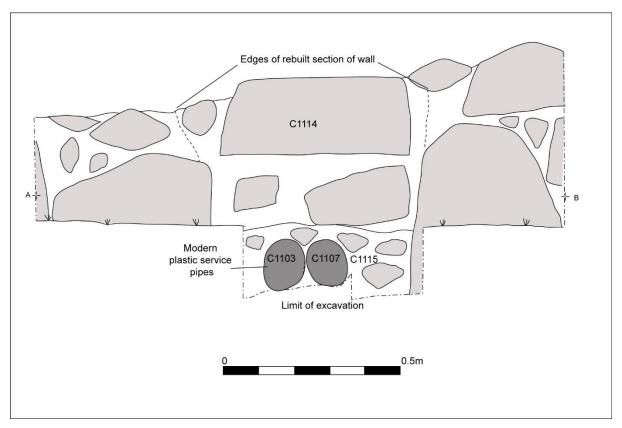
Trench 11. North-facing elevation across the end of the trench showing a rebuilt section of the Middle Ward curtain wall and the 1980s plastic service pipes cut through the curtain wall.
